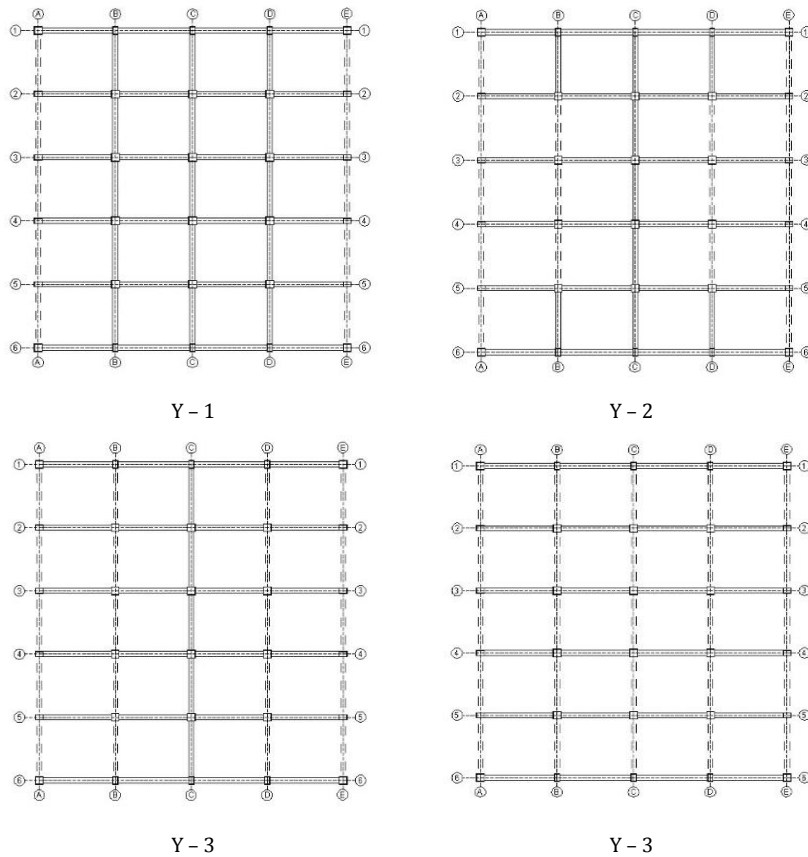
The case of infill walls in all of the building frames (plan image y-y).
